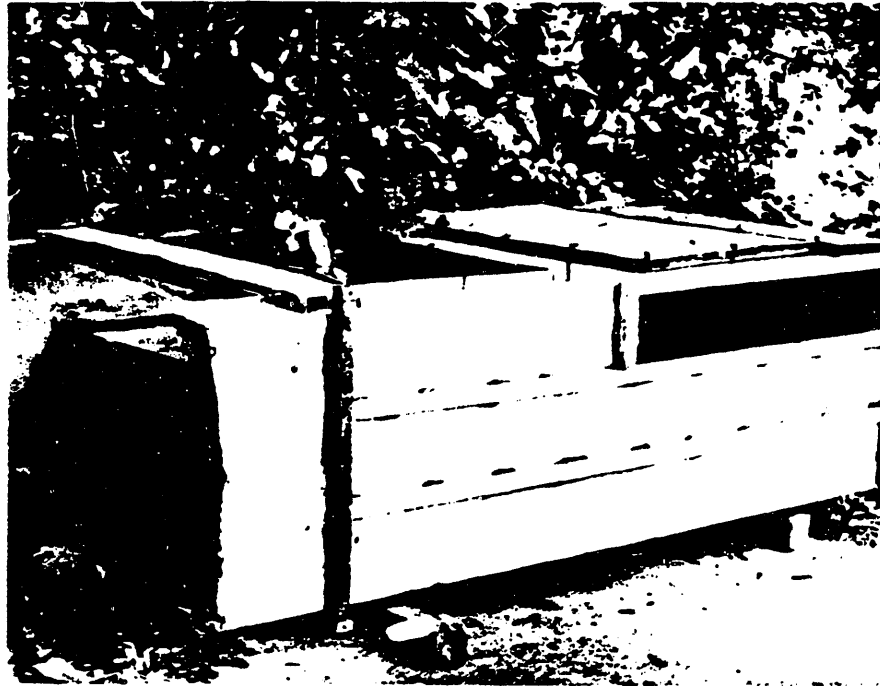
Stainless Steel Air-Handling Duct Used in Test #5
